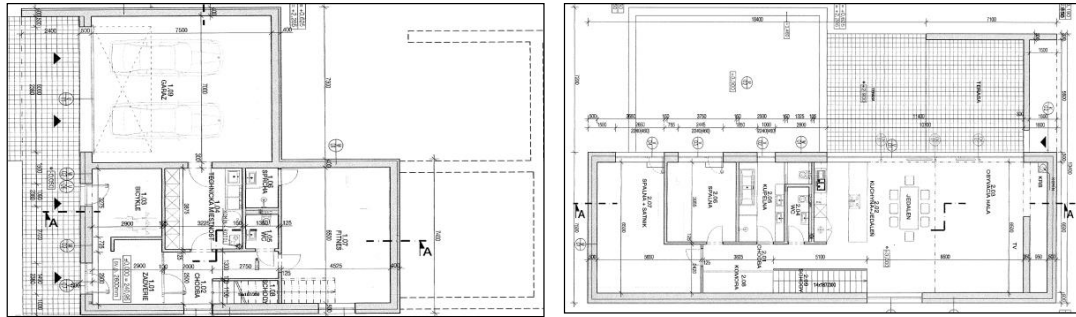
Ground plans 1st floor and 2nd floor of family house.
